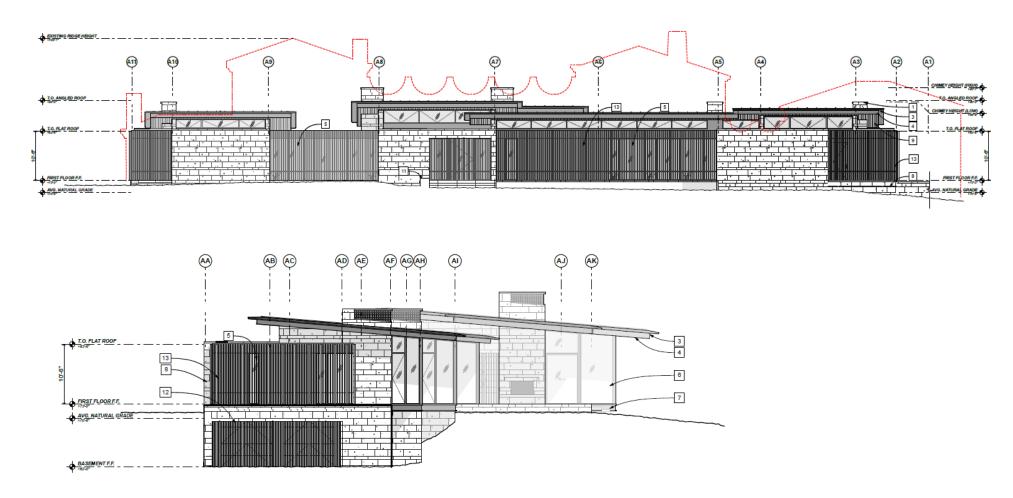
Proposed Exterior Elevations: The north and west elevations, respectively. The existing structure is outlined in red. (Source IX.1)
